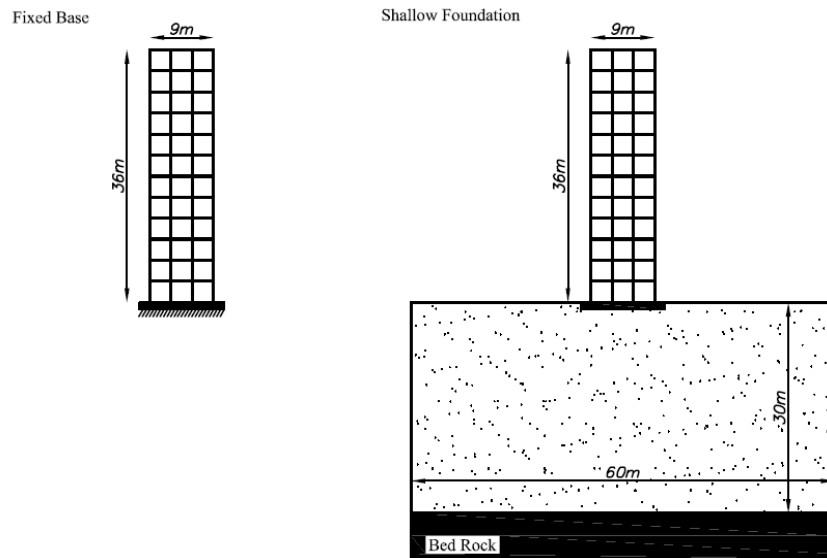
12-storey steel structure with the fixed-base foundation and shallow foundation
